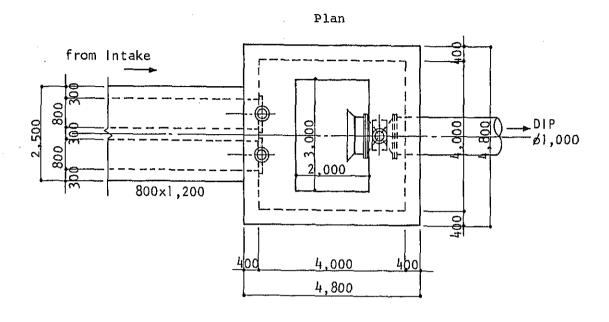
<u>INTAKE FACILITIES</u> (Northesst Plant)
